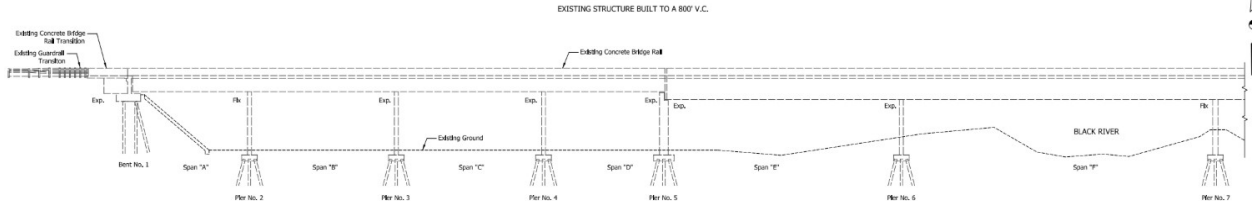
Elevation View of Spans 1-6 of the Bridge (NBI 33240) (2015)
